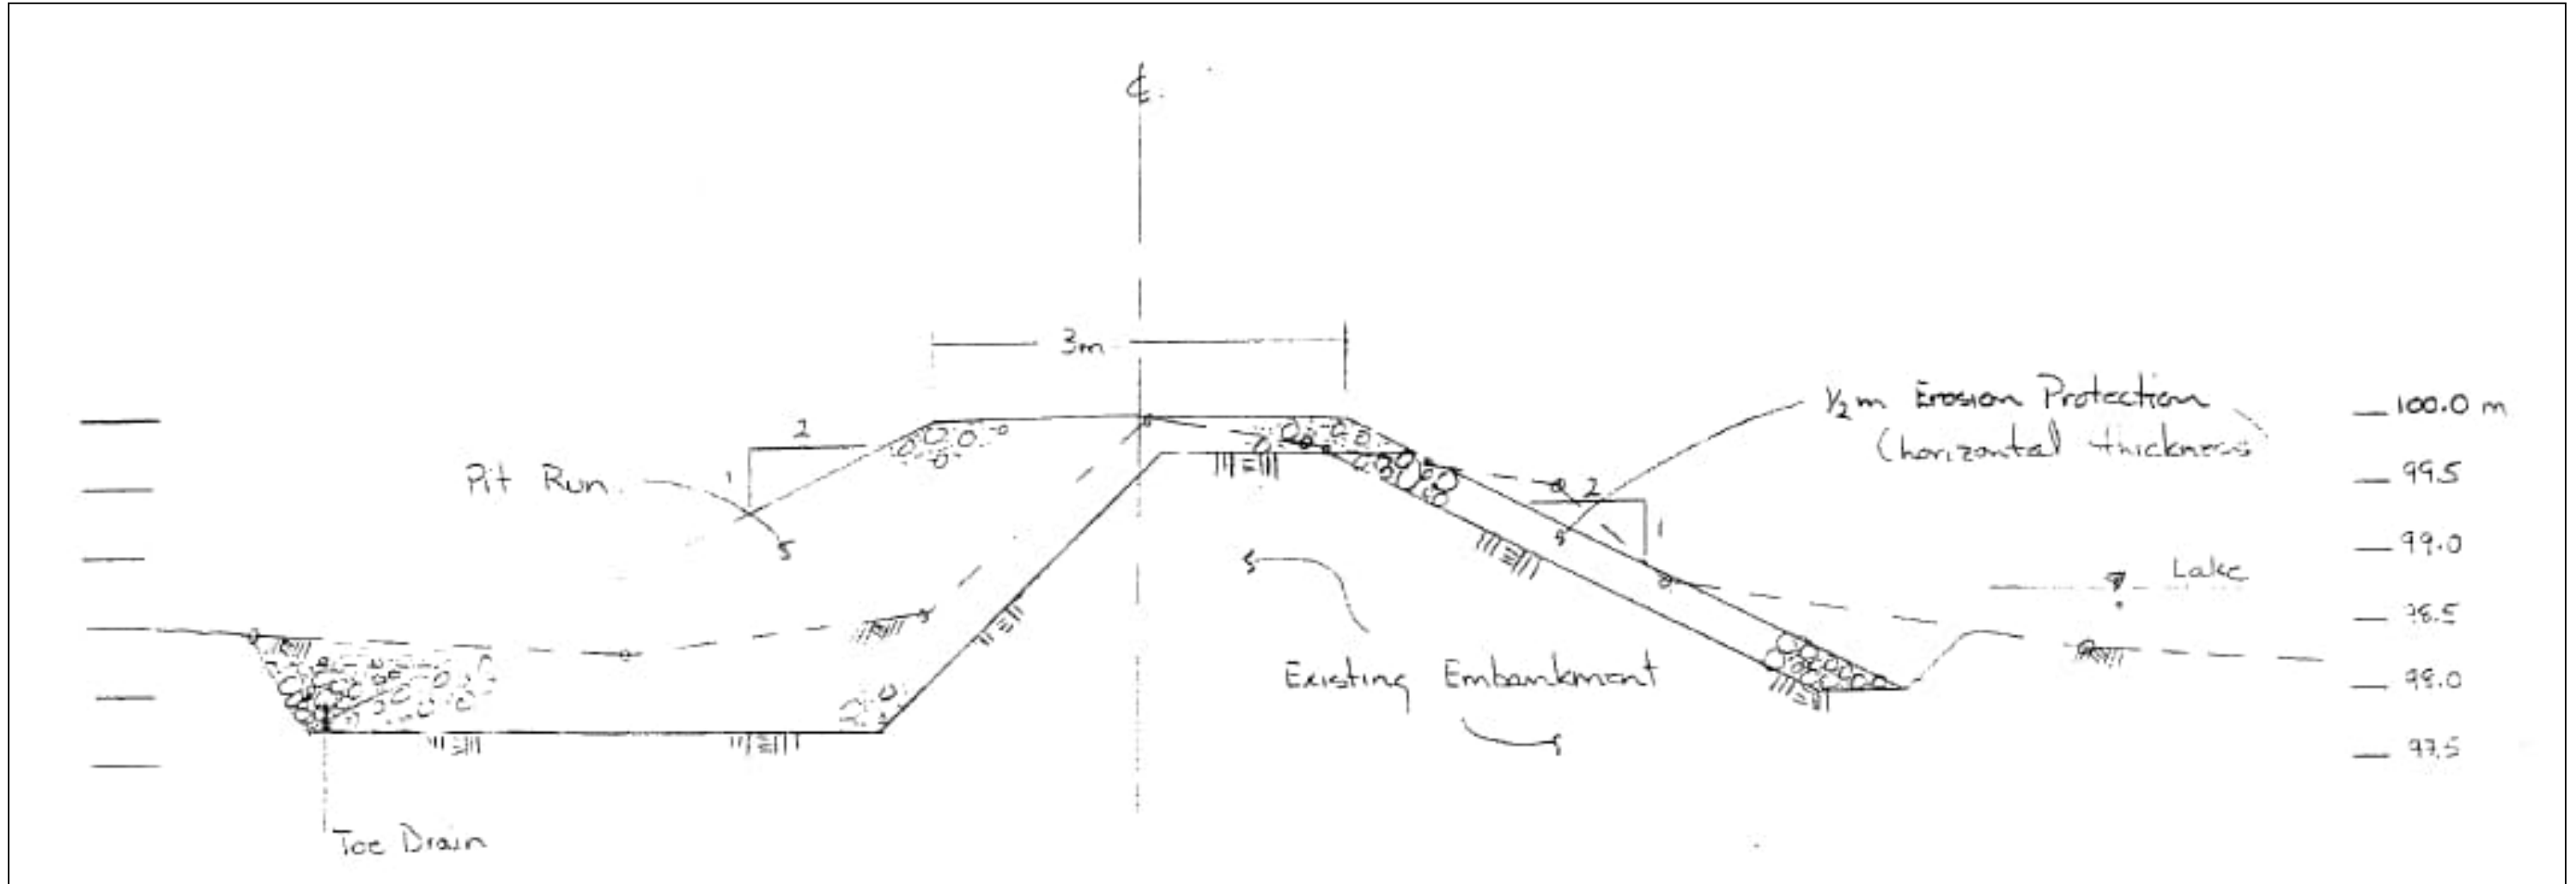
Cross Sections of Saddle Dam at Westwood Lake
